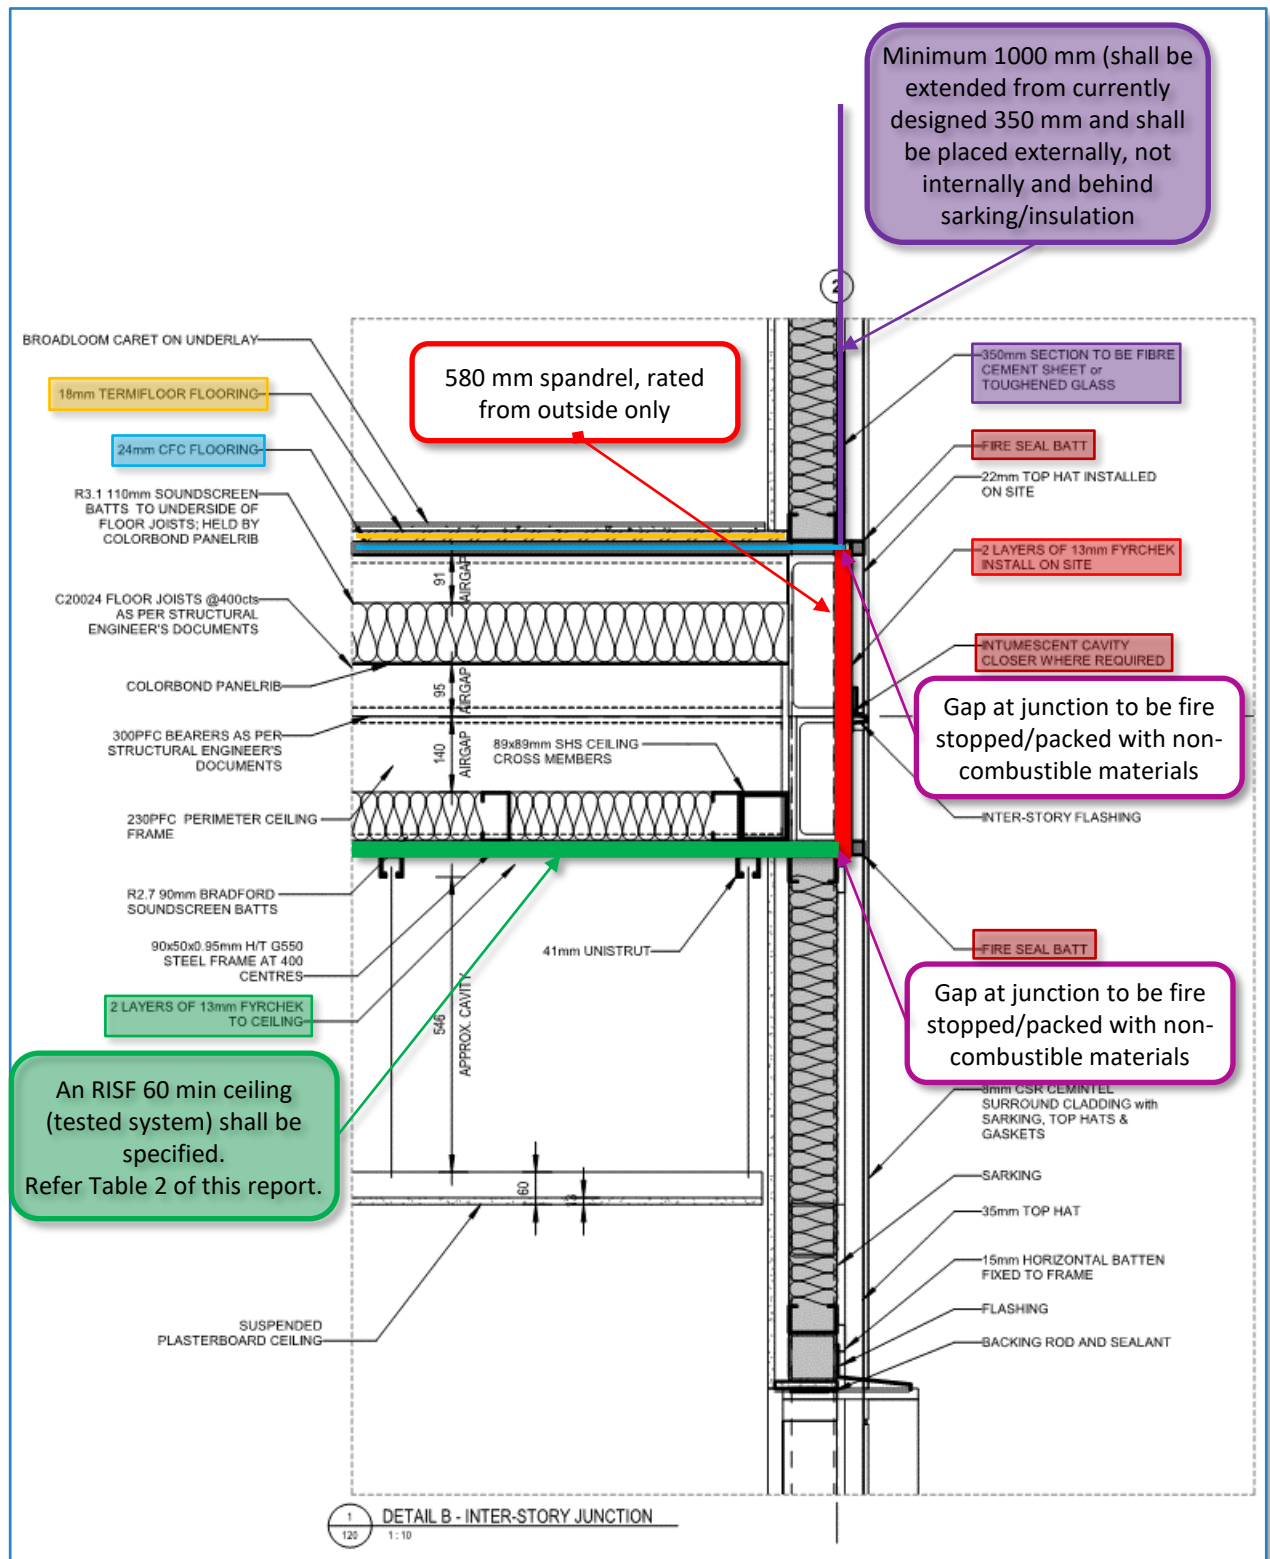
Section showing fire rated (RISF) ceiling, flooring materials and spandrel arrangement (For Blocks B, C & D being of modular construction with lightweight floor/ceiling system)
